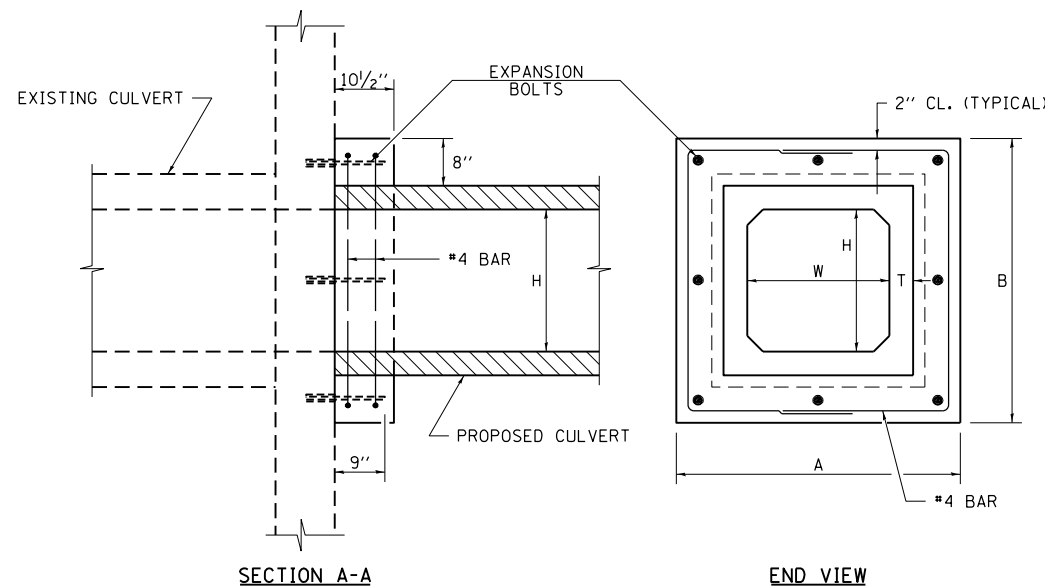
DETAIL OF CONCRETE COLLAR FOR BOX CULVERT EXTENSIONS
